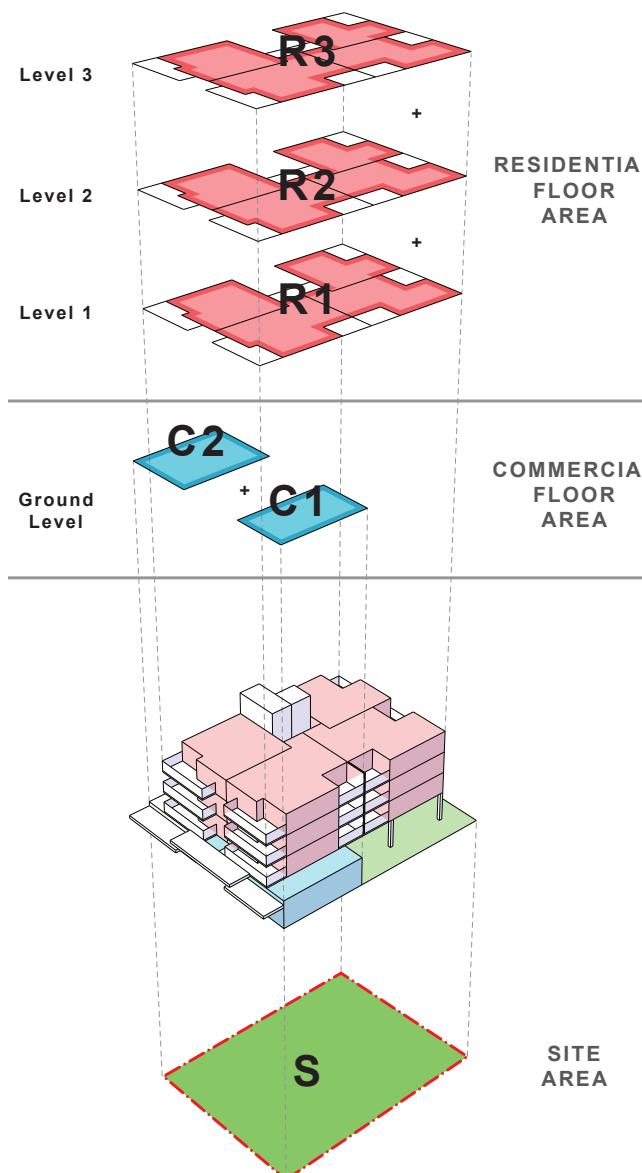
illustrates how a residential floor area and commercial floor area interrelate in a typical mixed-use development.
